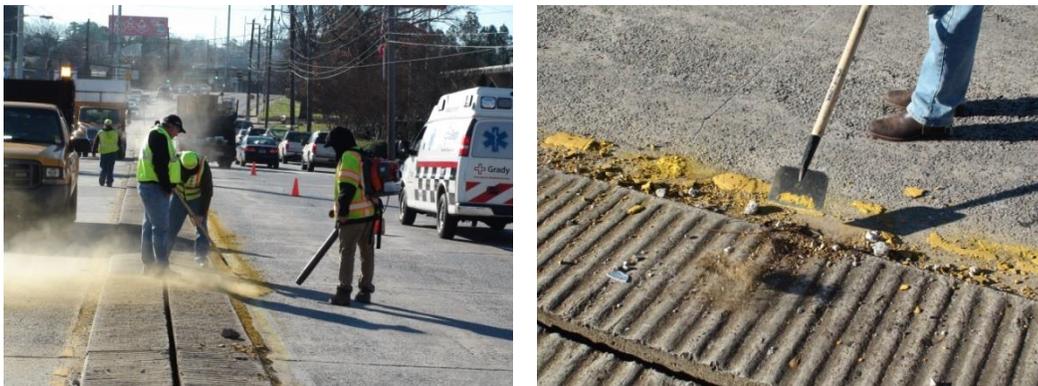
Thoroughly Clean Pavement Surface using Scraper and Air Blaster
